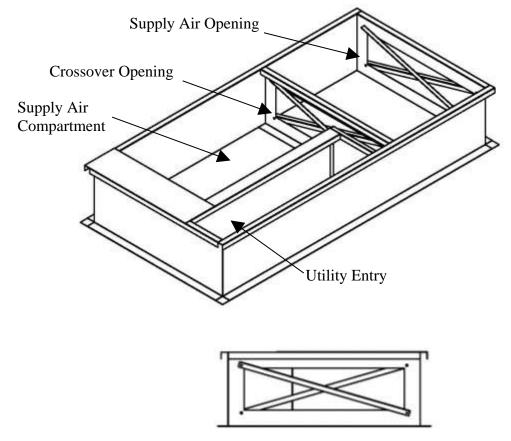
Acoustical Solid Bottom Curb with Horizontal Discharge Openings
